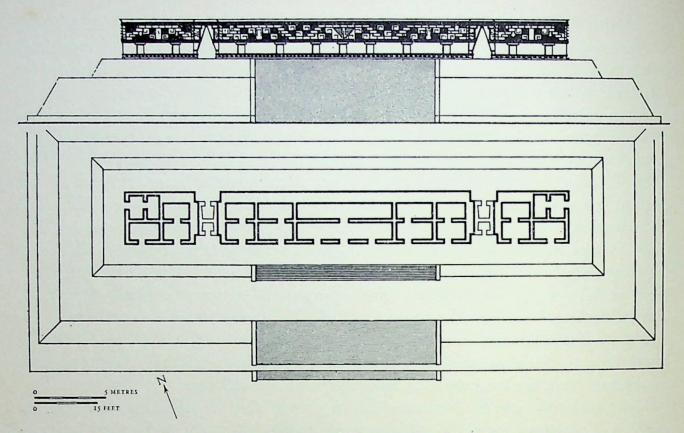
Uxmal, House of the Governor. Elevation c. 900
